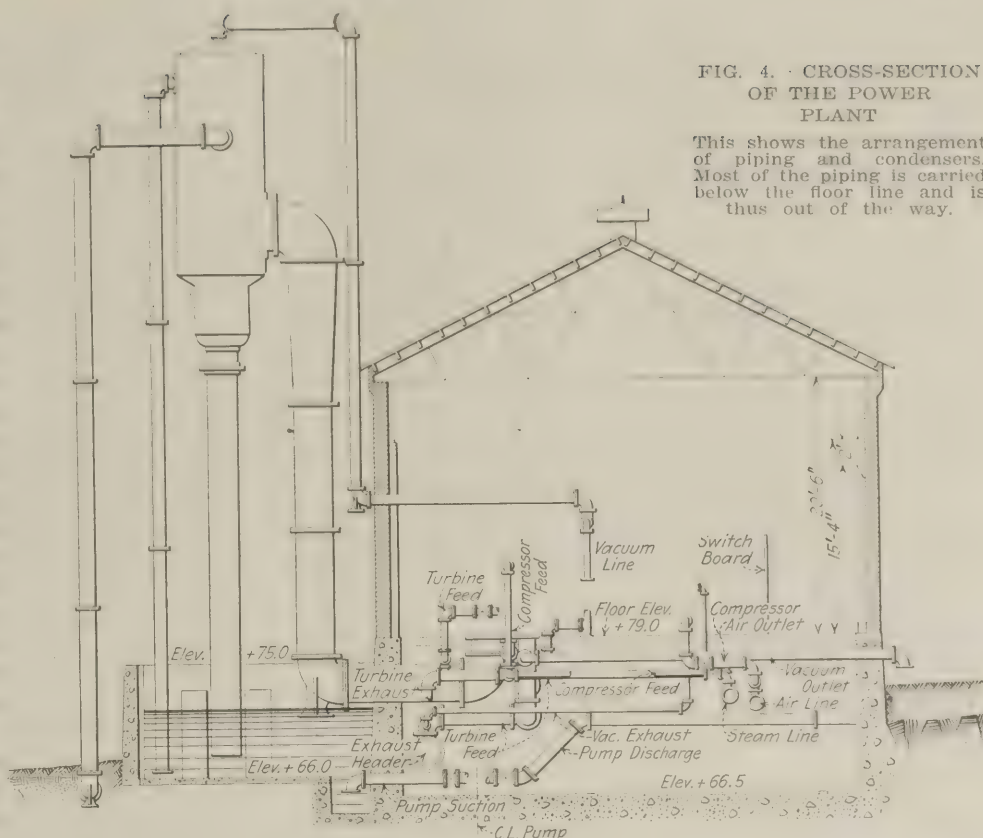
CROSS-SECTION OF THE POWER PLANT
